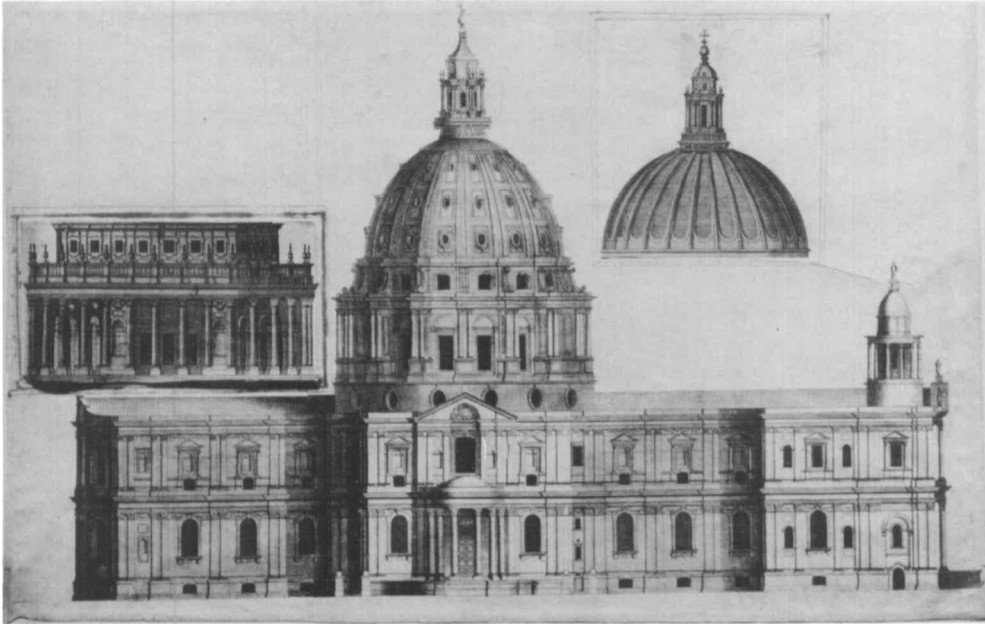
St Paul's. North elevation, proof engraving (SP105)
